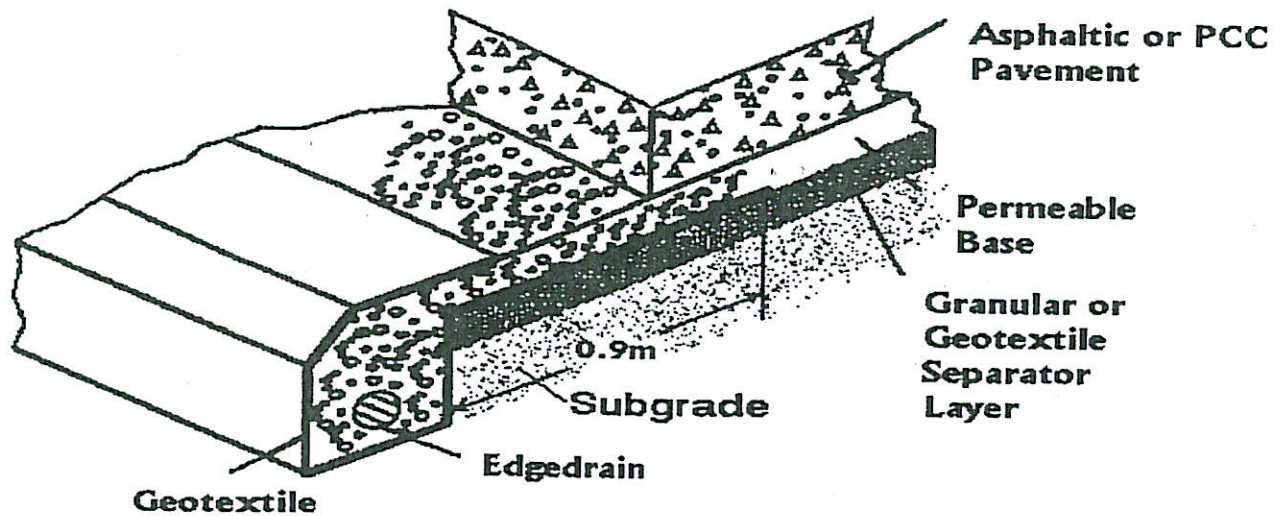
Drainable Pavement System (Christopher, 2001)
